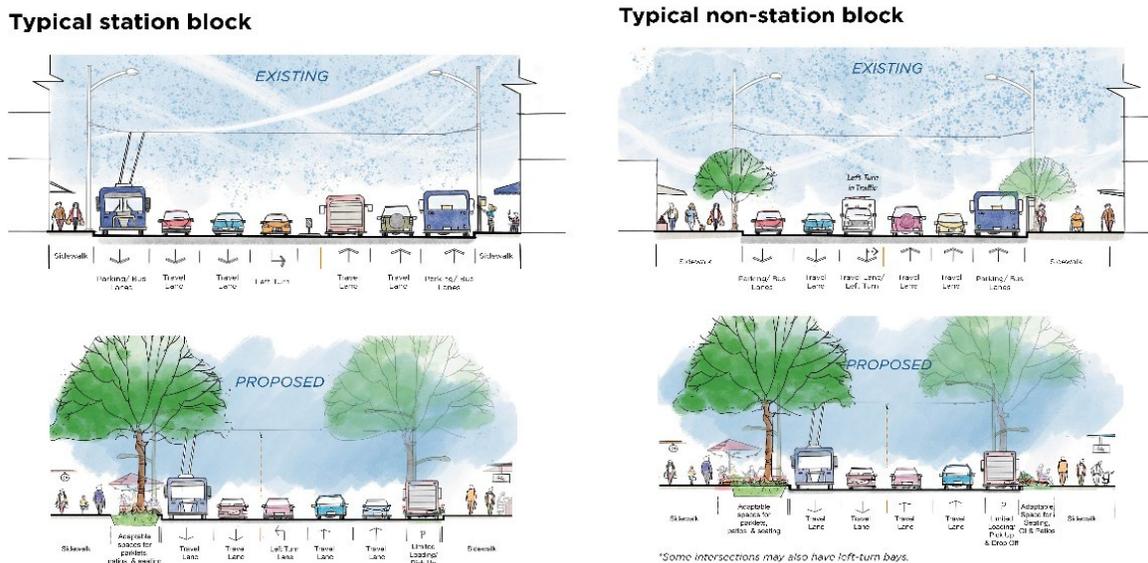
Broadway Today and the “Original Design” for Broadway as a Great Street, Broadway Plan
